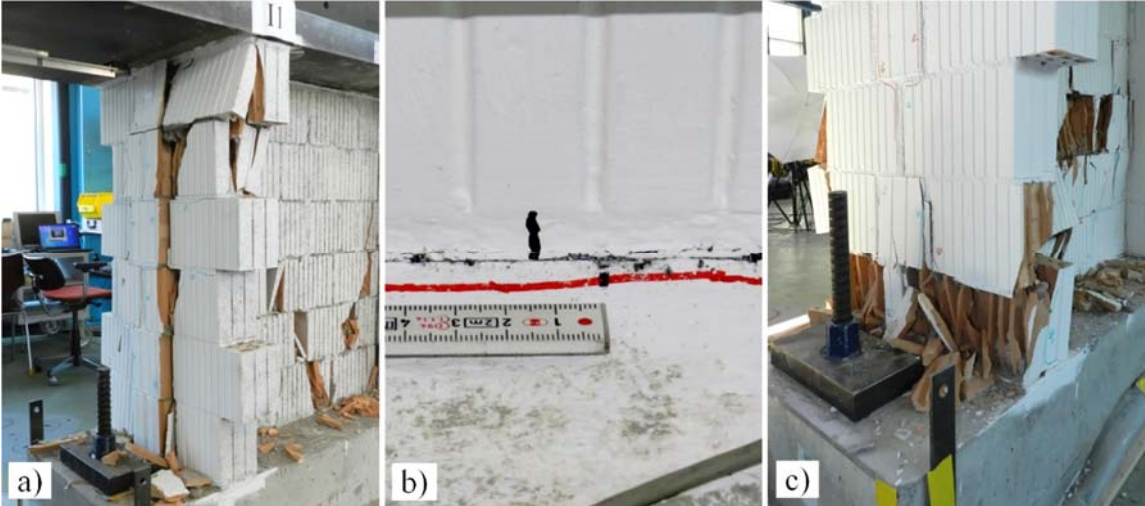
Failure modes of the selected wallettes of the first test series: a) punching of the web through the flange of Wallette I1; b) sliding in the bottom bed joint of Wallette I1; c) northern toe crushing of Wallette I4 [57]
